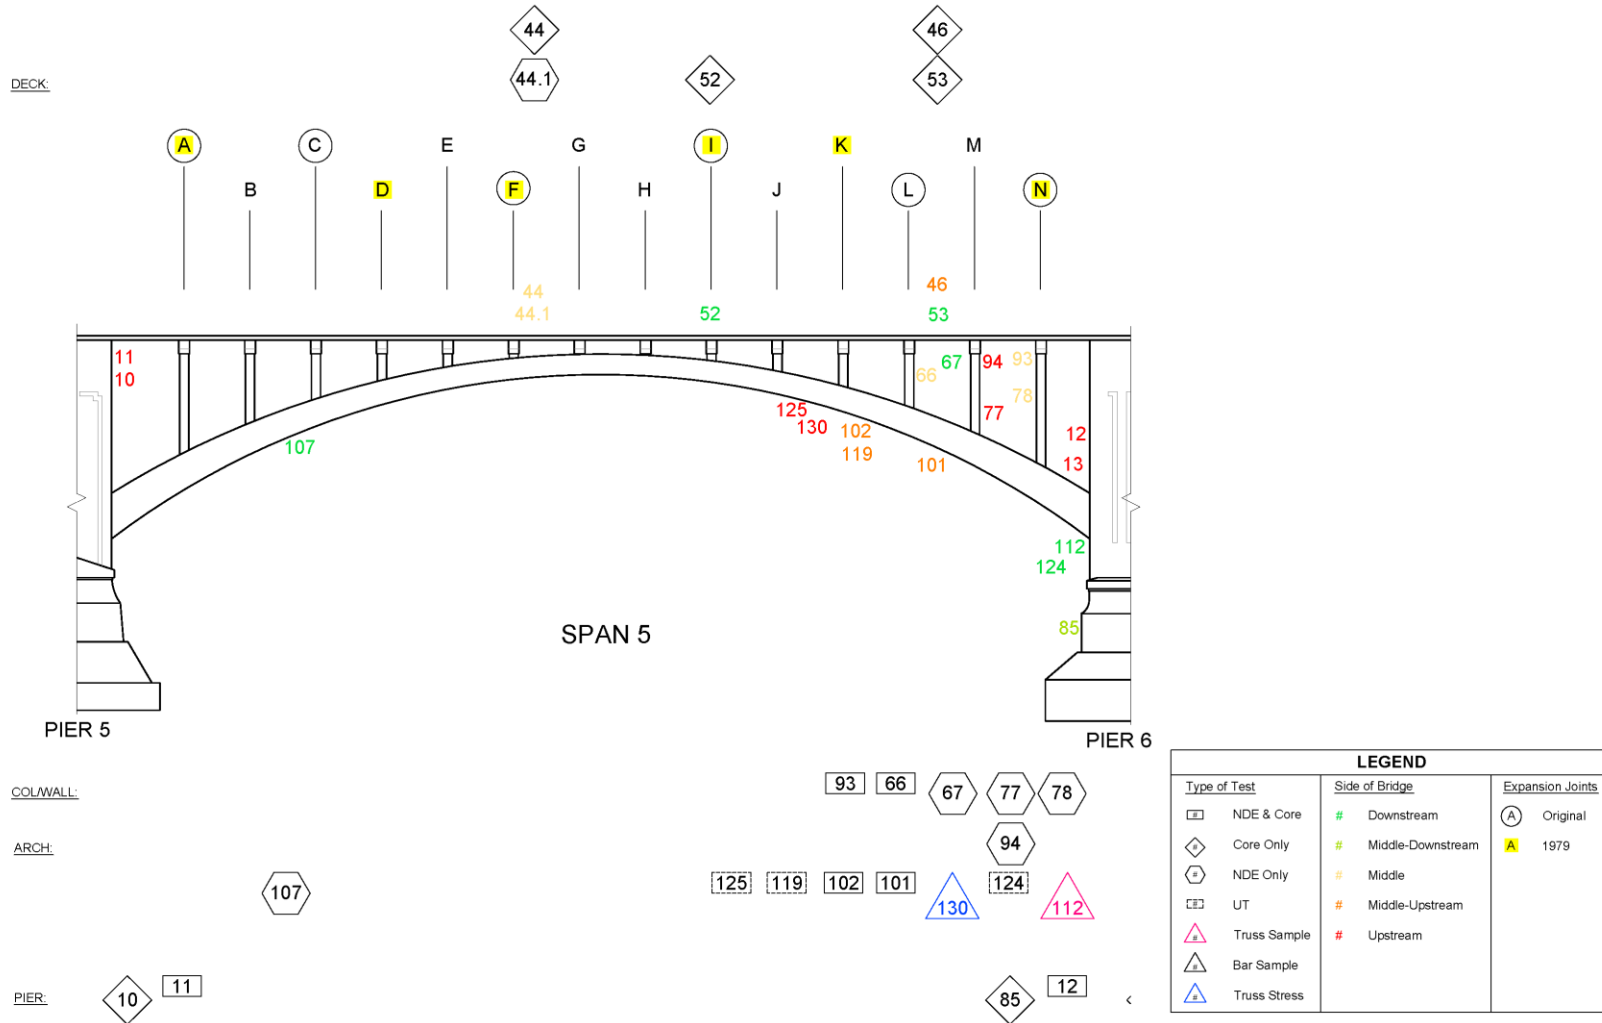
Follow-up Testing Location Summary - Arch Span 5.
